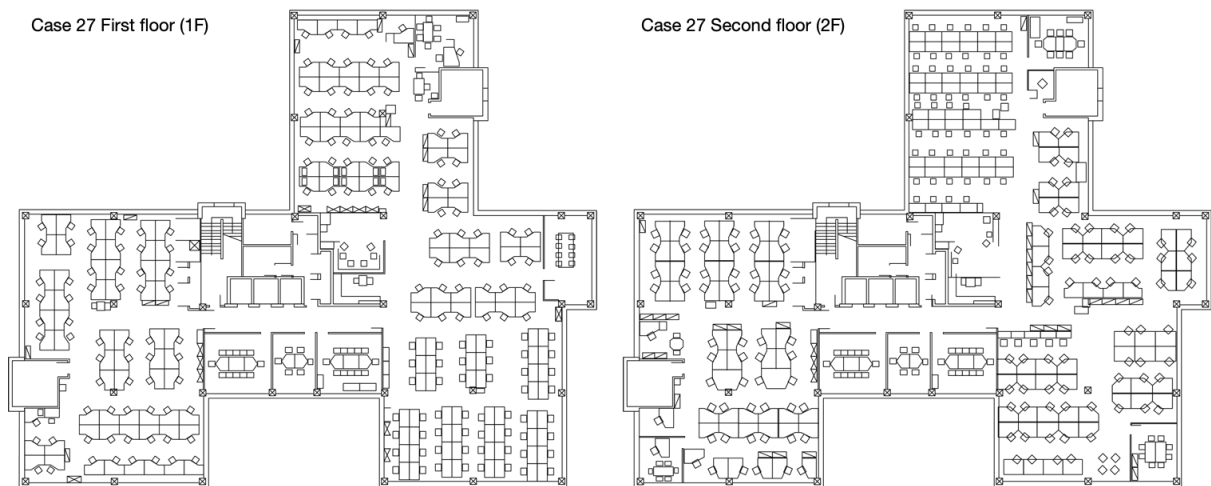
Floor plan, Case 27 First floor (1F) and Second floor (2F) (adapted from ref. (31))
